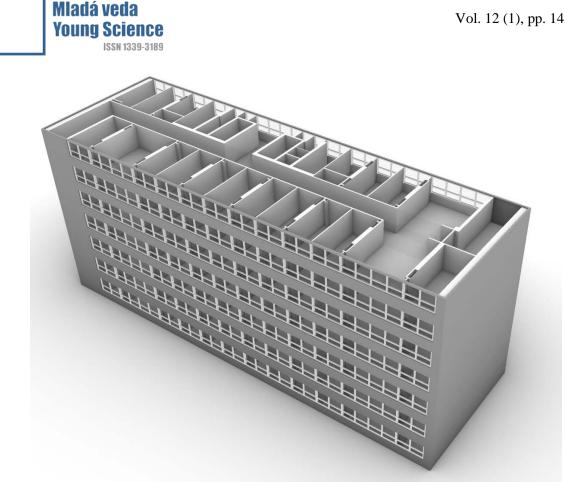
Model of a building with a horizontal section through 7th floor of a building Source: authors
